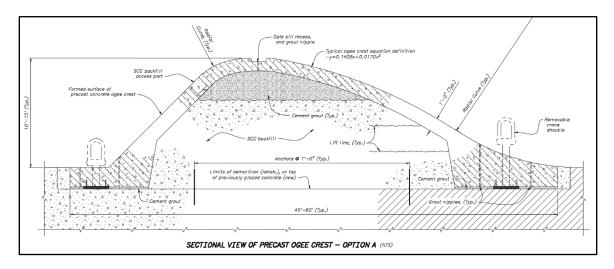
Showing Precast Concrete Ogee Crest, Option A, SCC Backfill and Cement Grout
